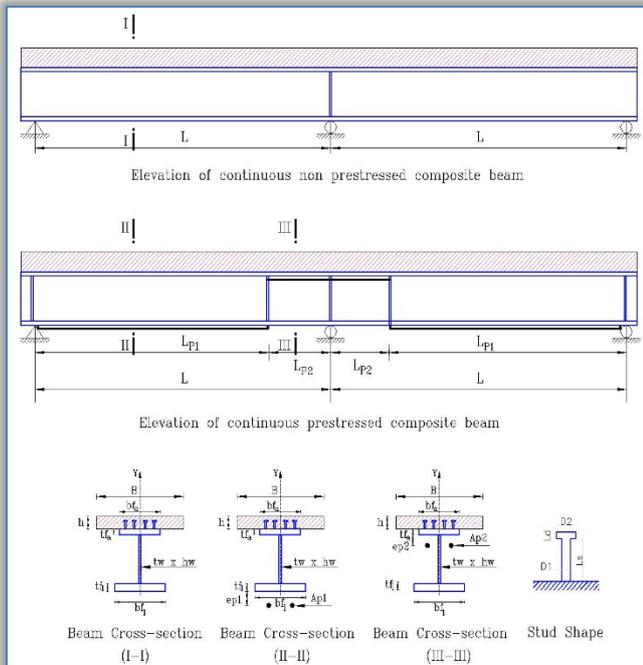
Continuous (two span) Composite beam without and with prestressing subjected to uniform load. The mechanical properties, and section for concrete slab, and steel beam are summarized in tables 3 to 4. Also the distances from bottom and top steel flange and force in cable is shown in table 5.
